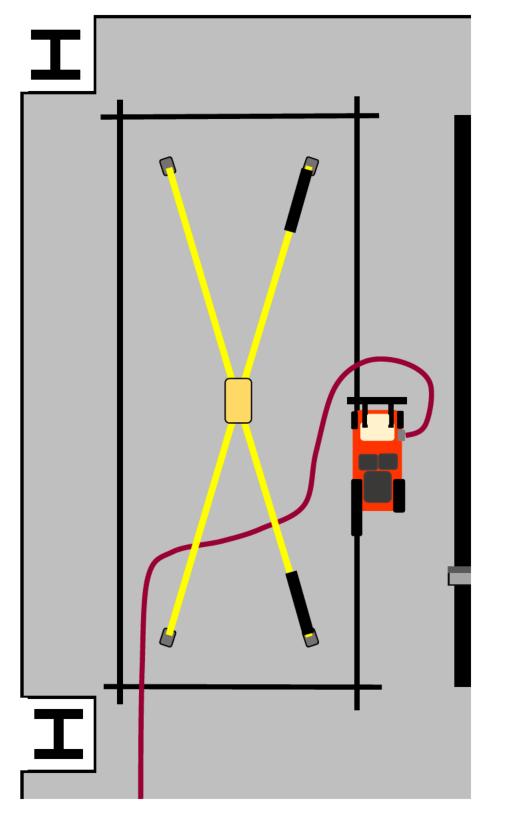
(cont.): Planar view diagram of the northeast corner of the CF Project test frame showing the sectioning of Slab 4. (b) Position of the floor saw and cooling water hose prior to cutting the south face of Slab 4.
